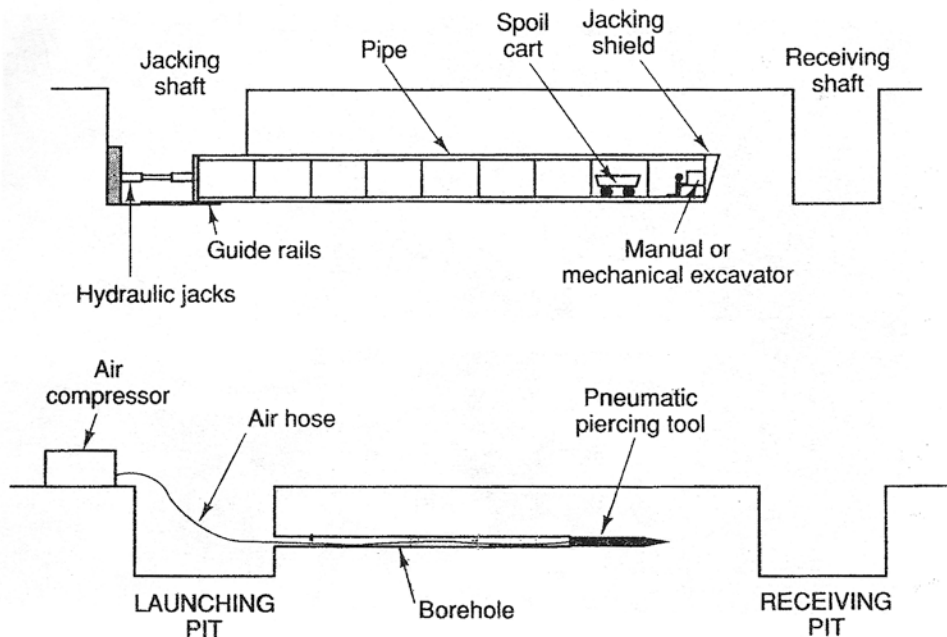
Installing a utility line by pipe jacking (upper picture) and by horizontal earth boring (lower picture)
